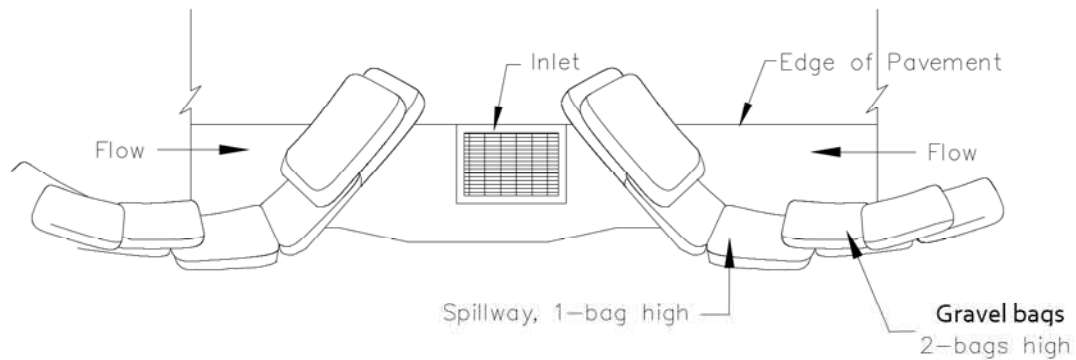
EXHIBIT "C" (Stormwater Pollution Prevention Plan)
